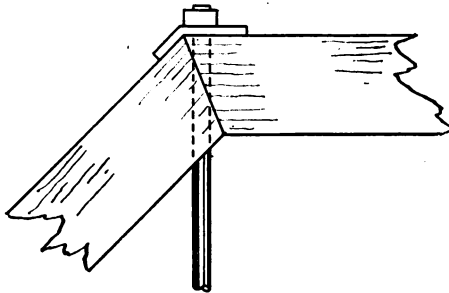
SIMPLE UPPER-CHORD DETAIL.
